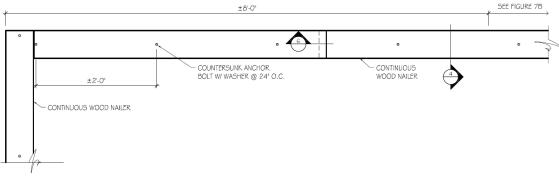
A - ROOF EDGE WOOD BLOCKING @ CORNER - THROUGH BOLT ANCHORAGE 8'-0" FROM CORNER
